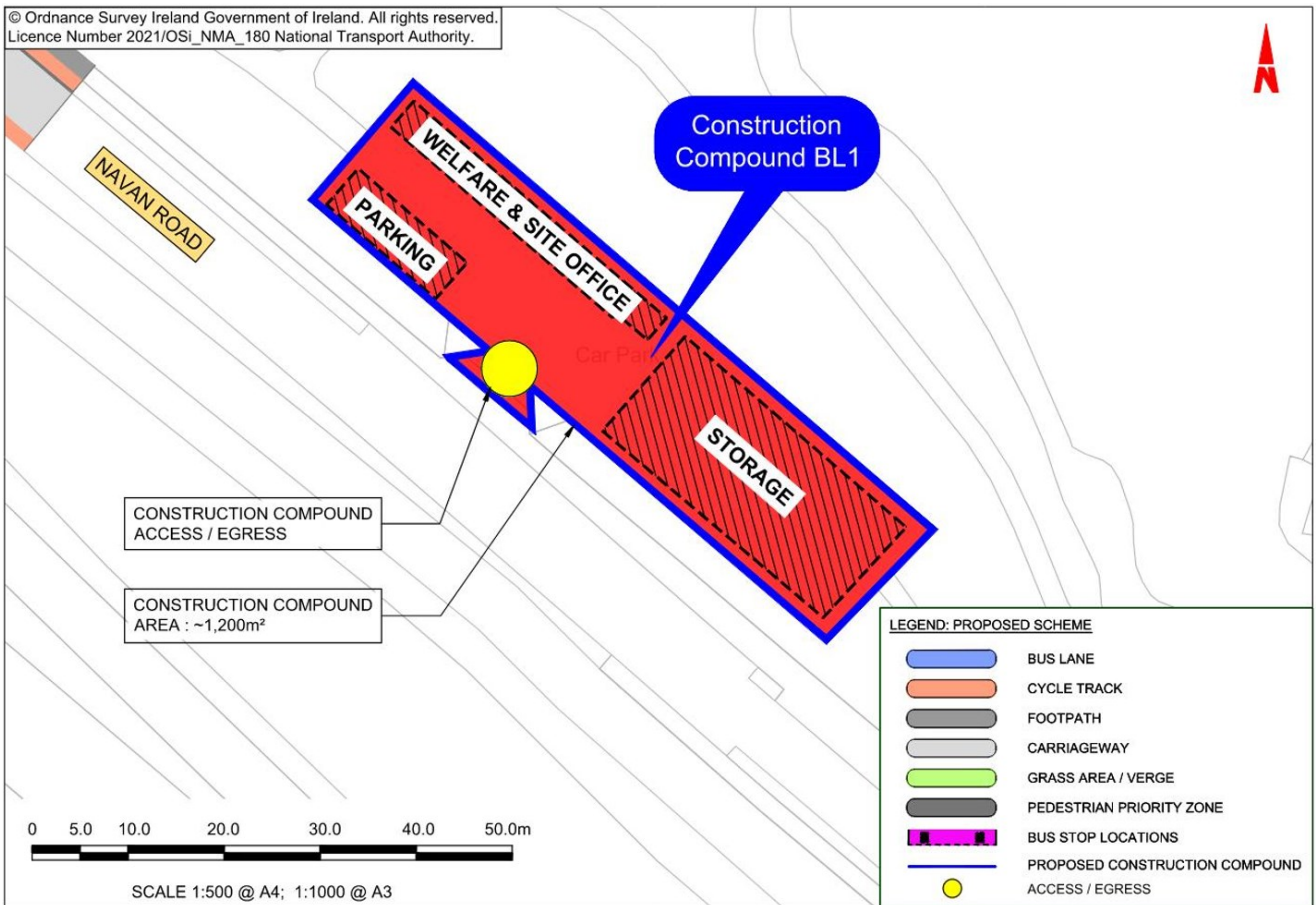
Location, Extent and Layout of Construction Compound BL1
